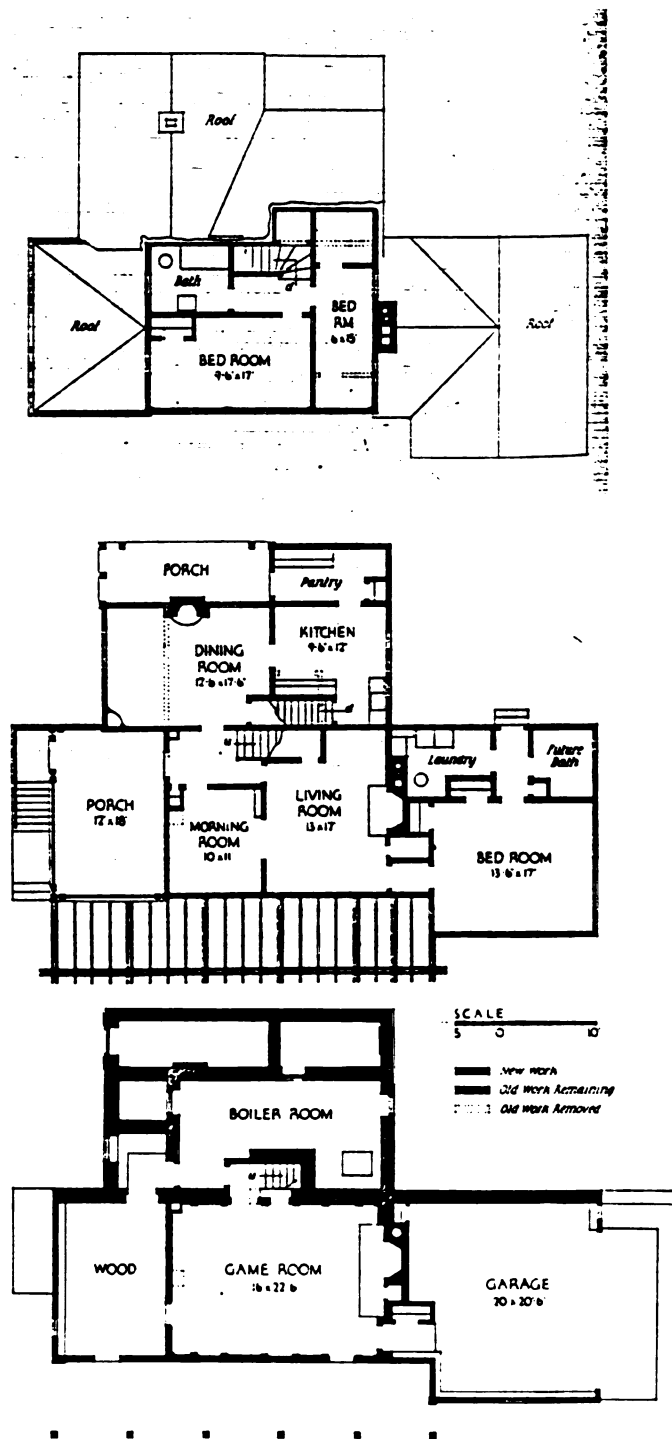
Elisabeth Coit, floor plans for Philip Maguire house, from "Steps Toward Modernization."
